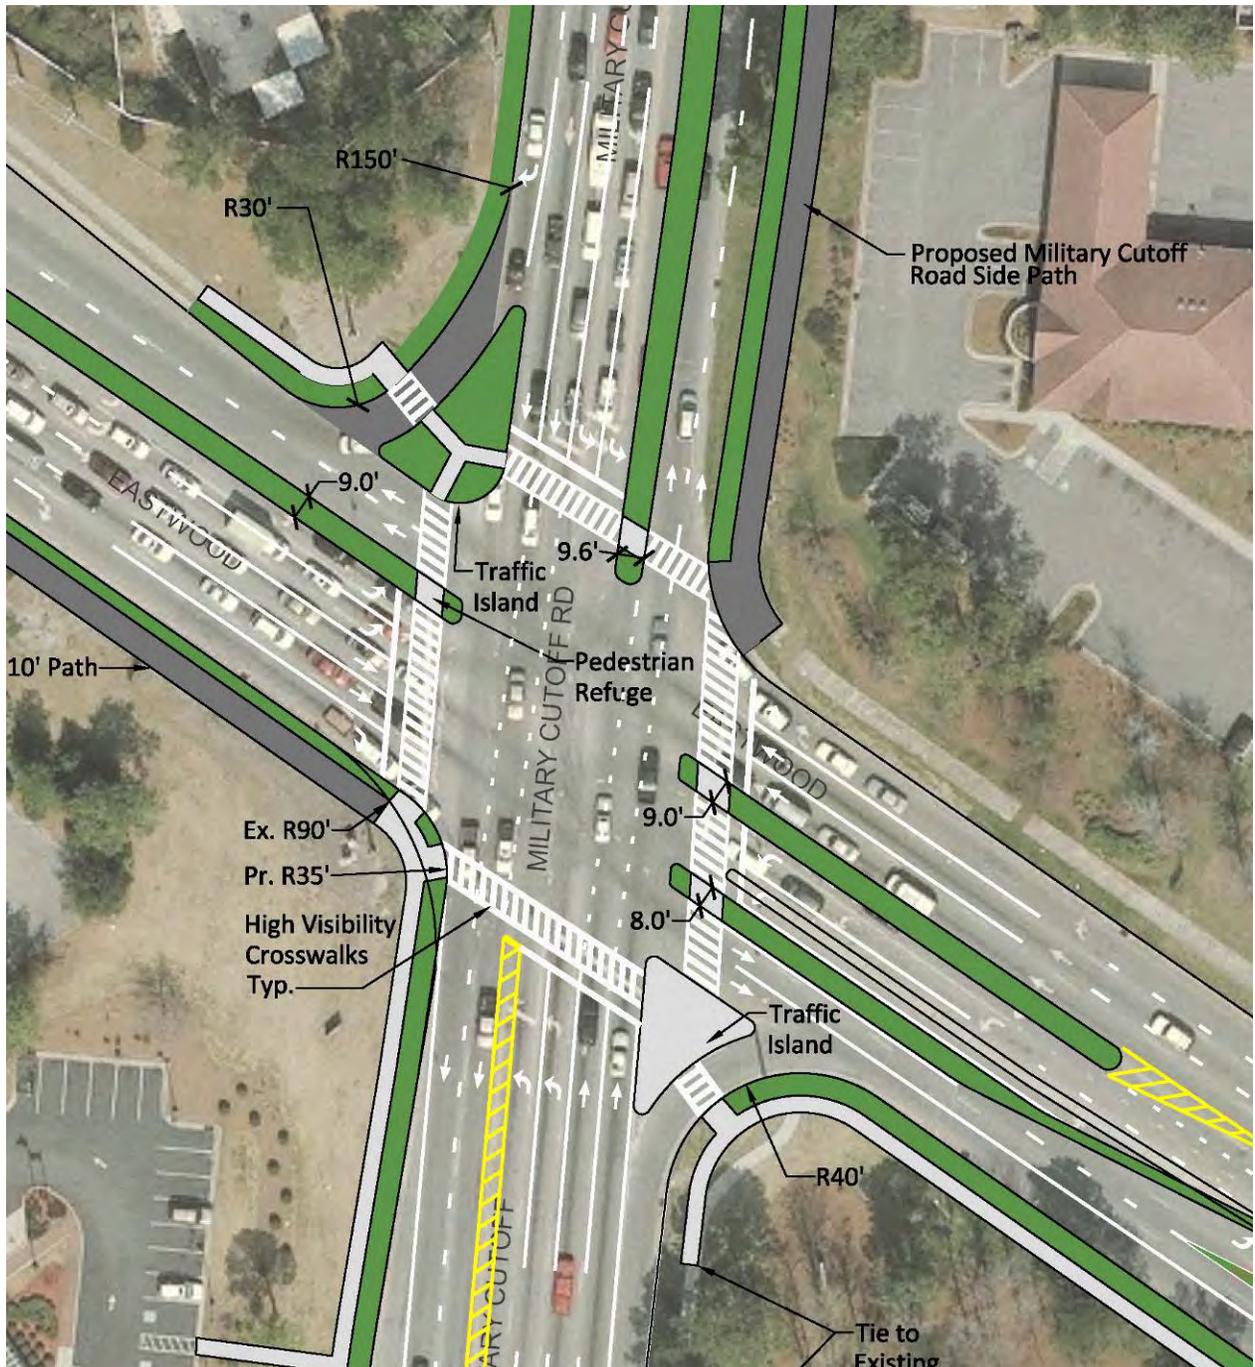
Proposed changes to Military Cutoff Road Intersection with Eastwood Road.
